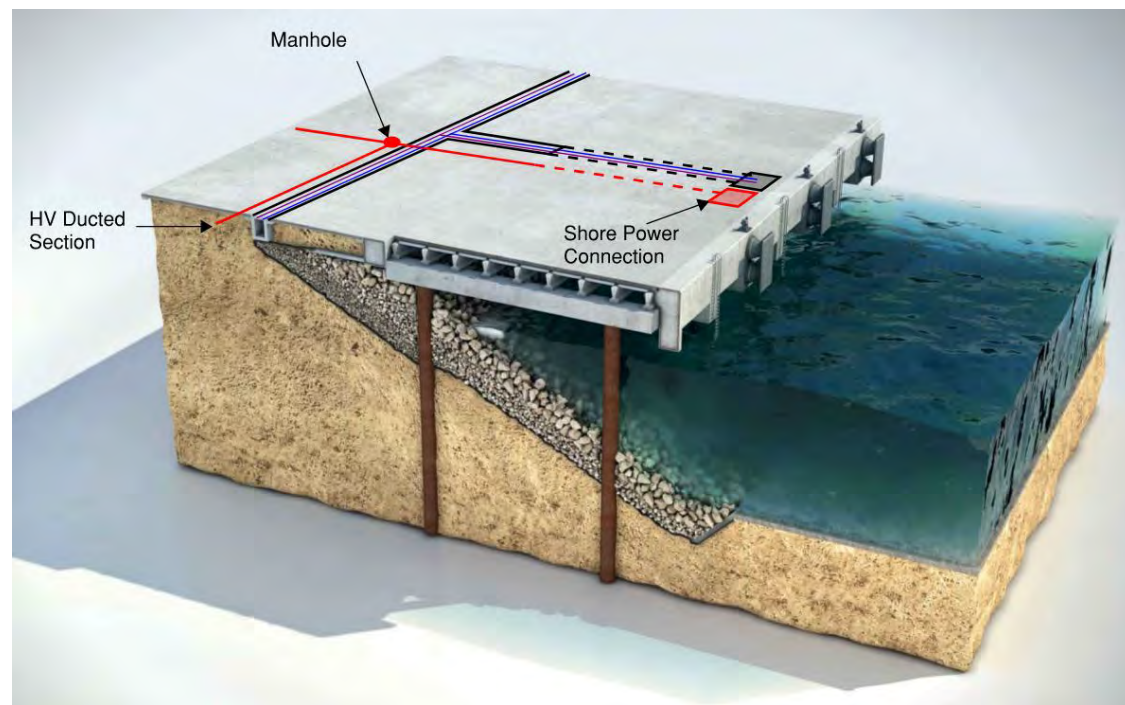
26 Proposed power cables beneath suspended deck (aerial view)
